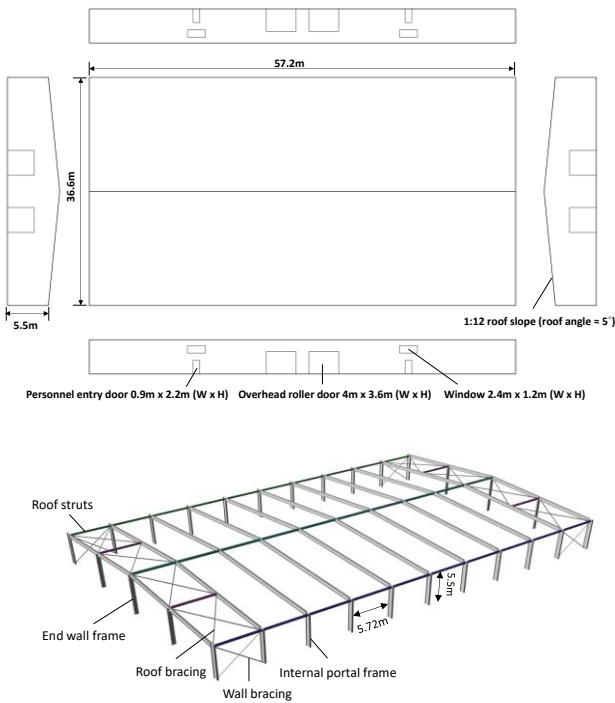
Plan view, steel framing and bracing of the prototype industrial building.
